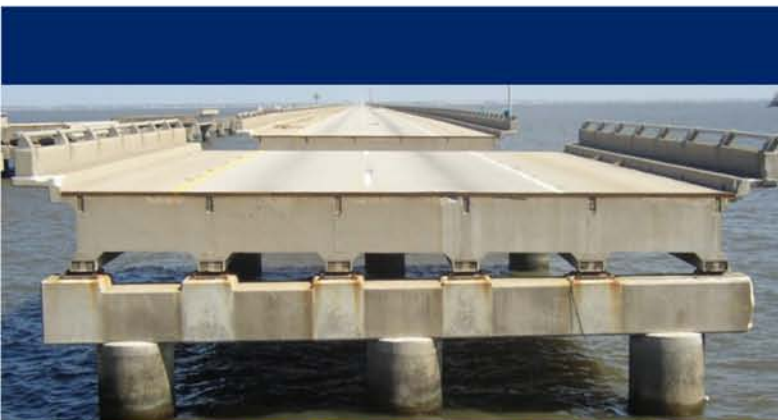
Typical cross section and diaphragms underneath the bridge decks
